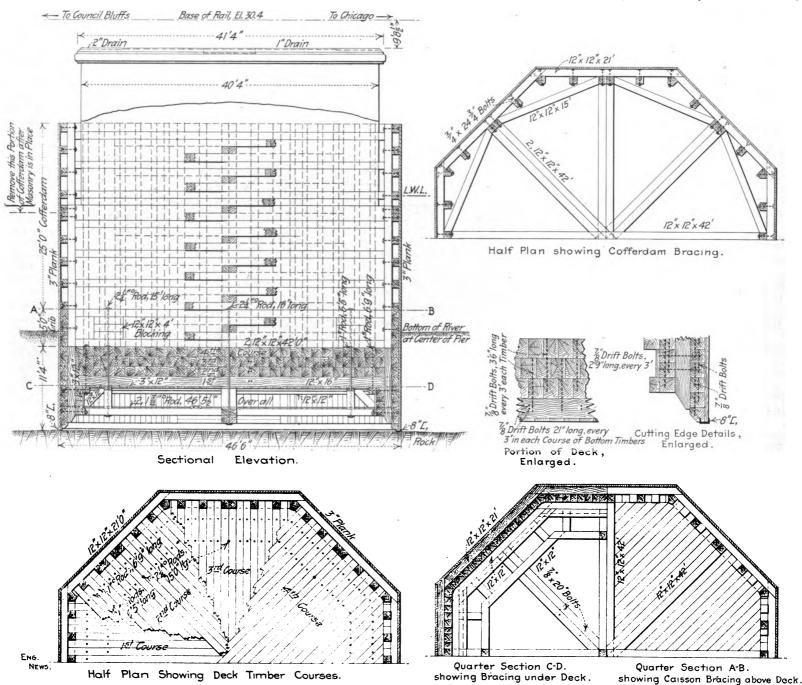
CAISSON, COFFERDAM AND MASONRY FOR THE CENTER PIER OF THE DRAW SPAN BRIDGE; CHICAGO & NORTHWESTERN RY.
